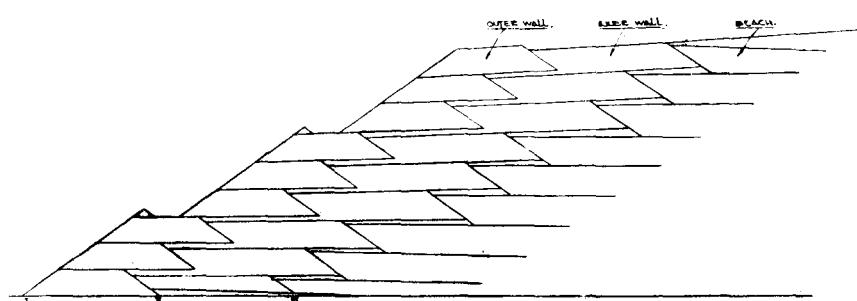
Idealized section showing repositioning of II and III to accommodate wall slope (wall with terraces)
